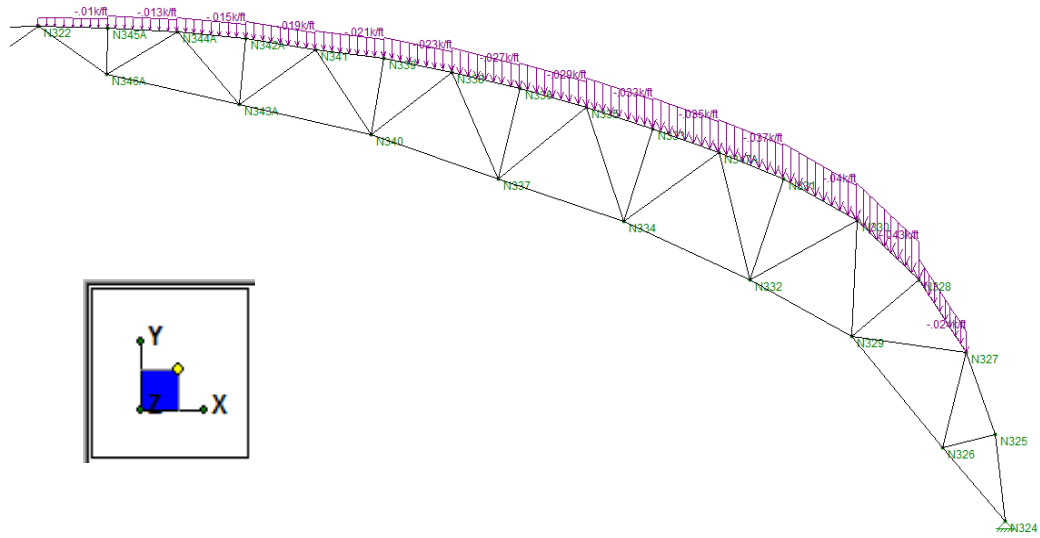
Snow Load-Unbalanced - Overhang Loading on Hangar Q - Elevation
